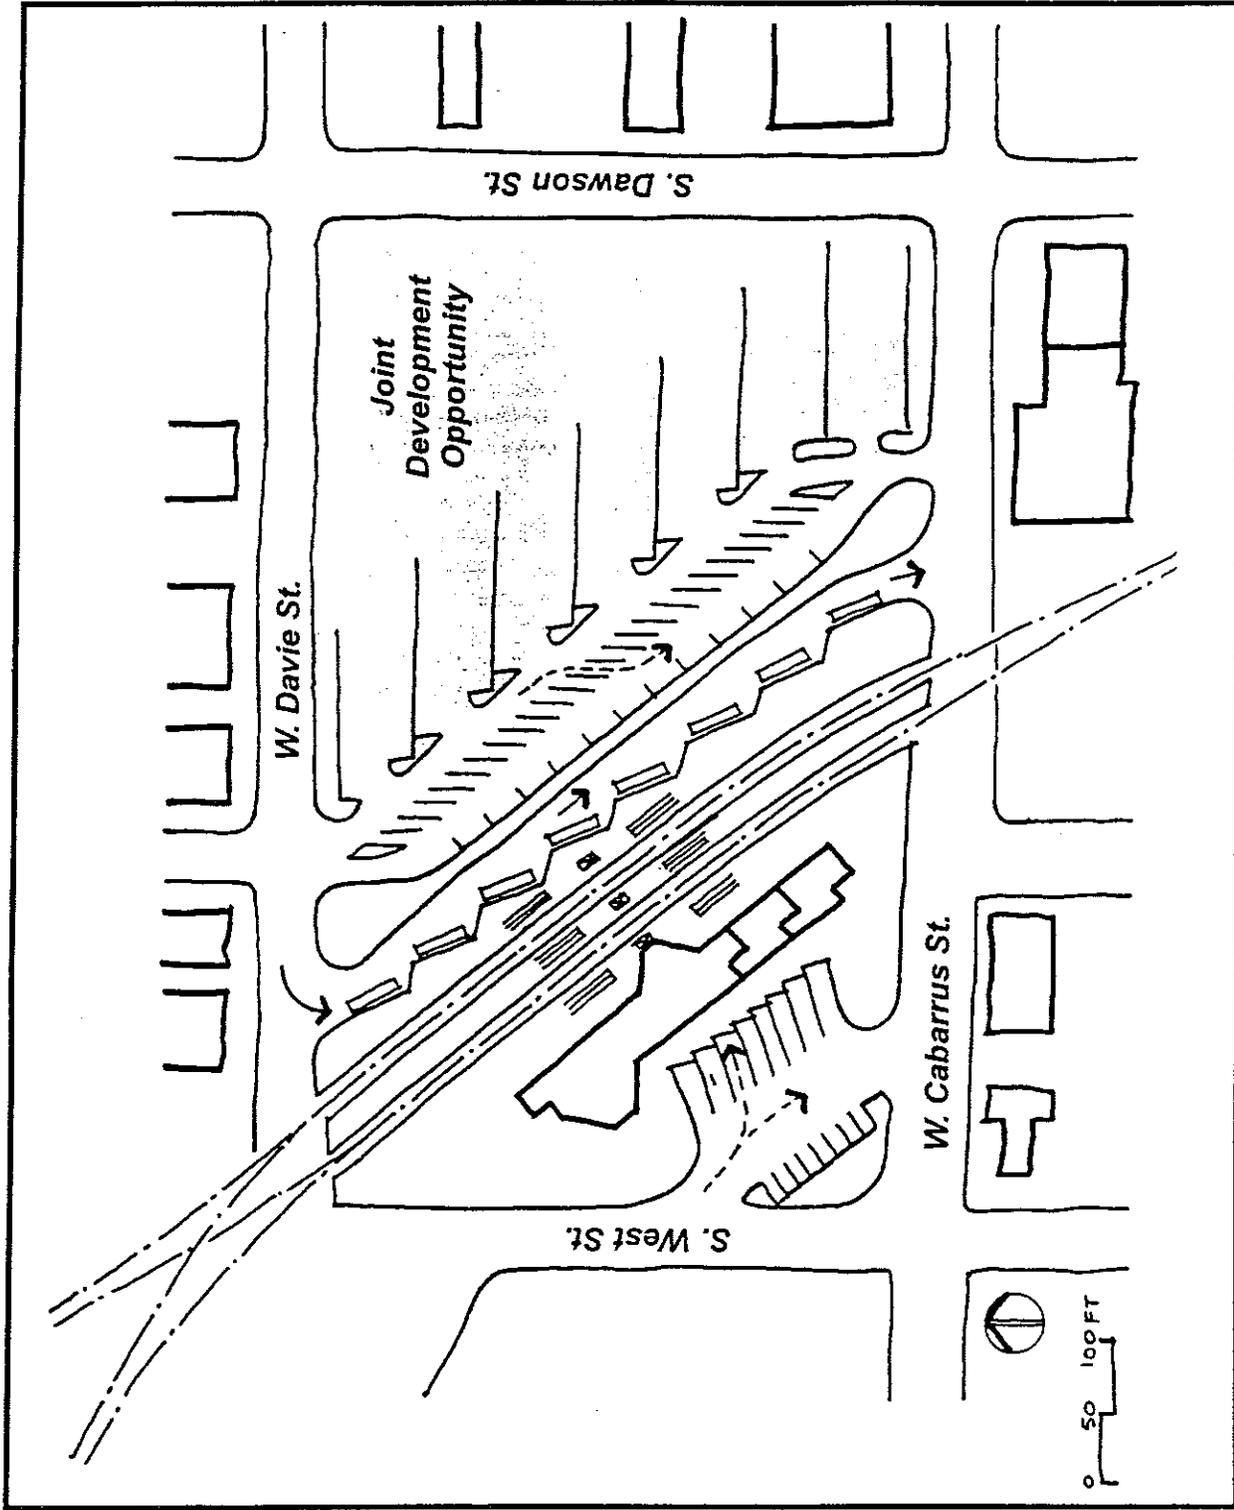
Site 1/South Leg of the Railroad Triangle
